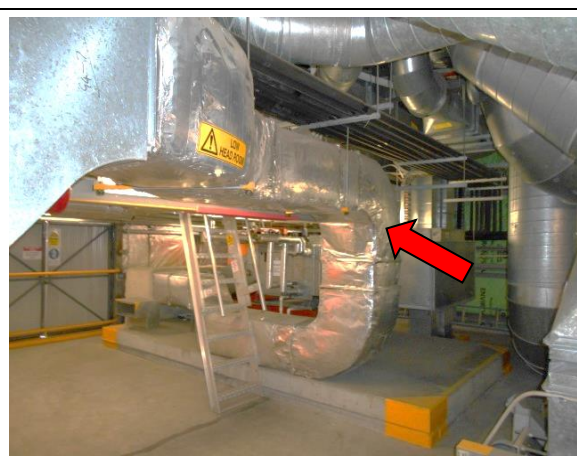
Level 4, Plant Room, Ductwork – SMF insulation
